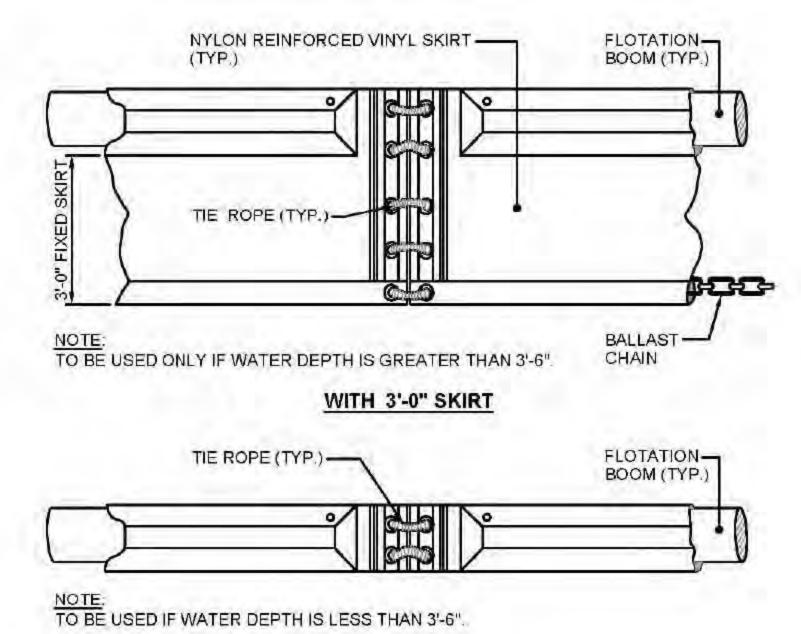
Perimeter Barrier to be Installed Around Dredge Material Stockpiles
